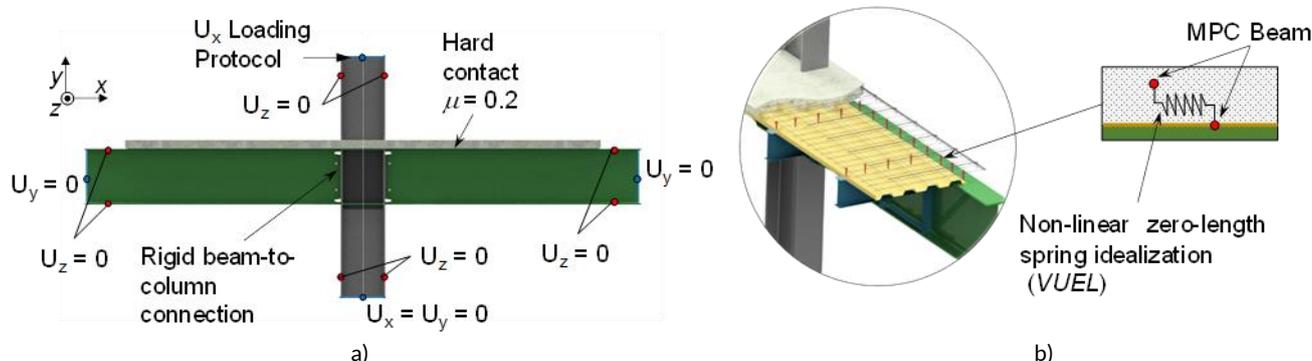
a) Continuum finite element model boundary conditions and beam-slab interaction; b) shear stud detail
